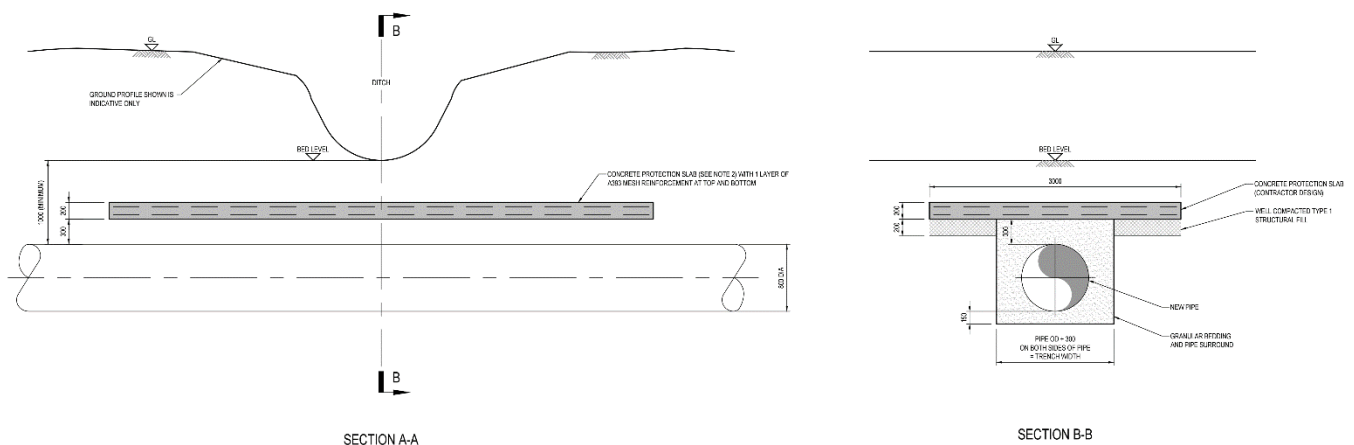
Draft Typical Detail Drawing of a ditch crossing
